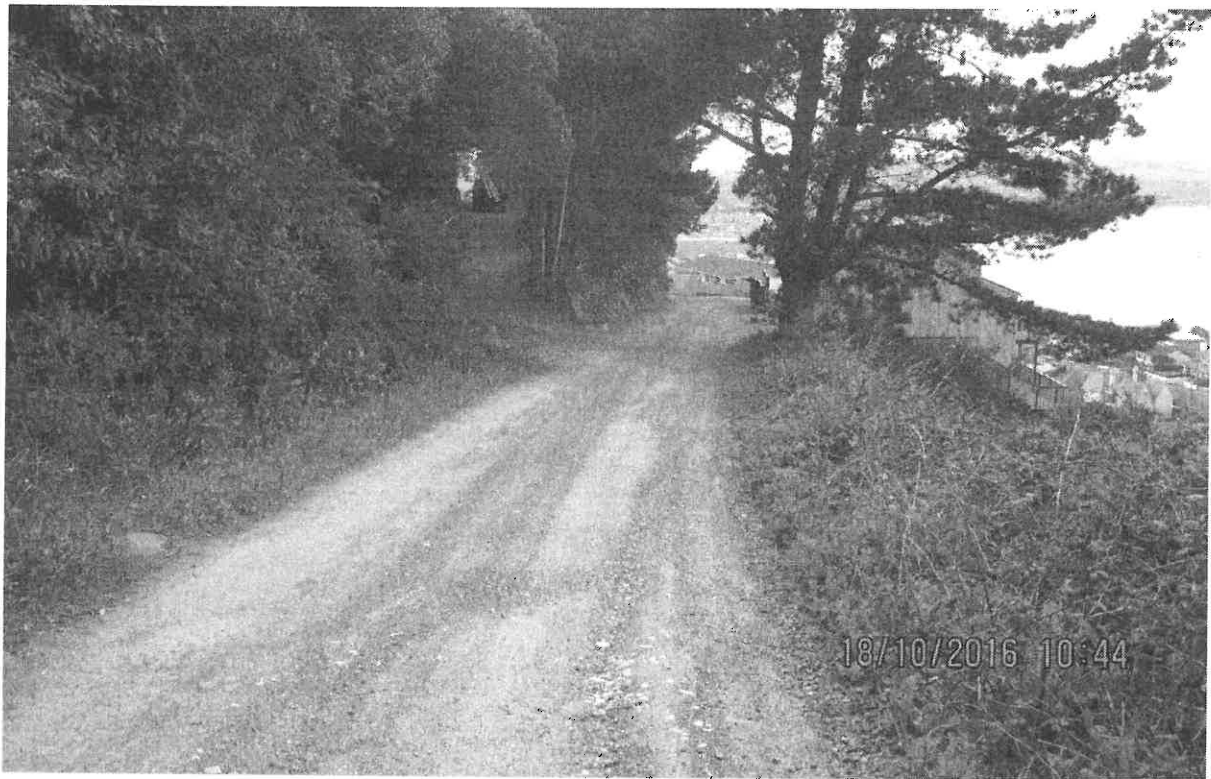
The driveway to 113 Cliffs Road branches off the left and has a hairpin bend when driving up Lyders Road. 107 Cliffs Road is in the centre of the photo, and 105 Cliffs Road is behind the tree. The sealing of SUB-2013-17 and SUB-2015-96 will finish more or less at this point.
